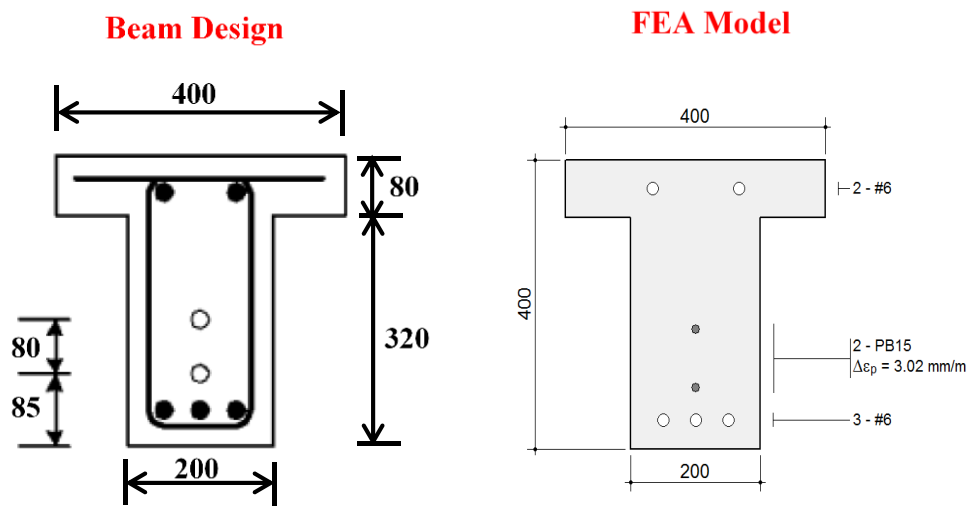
Beam cross section dimensions (mm); 1 in=25.4 mm (Lin et al., 2012)
